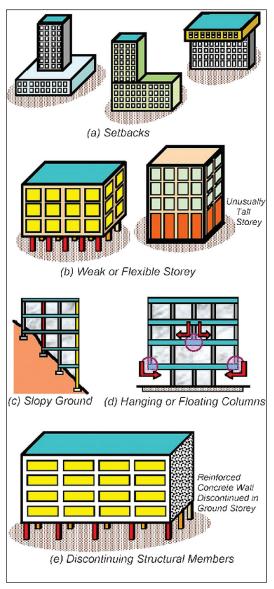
Vertical Layout of Buildings: Sudden Deviation in Load Transfer Path Along the Height Lead to Poor Performance of Building
